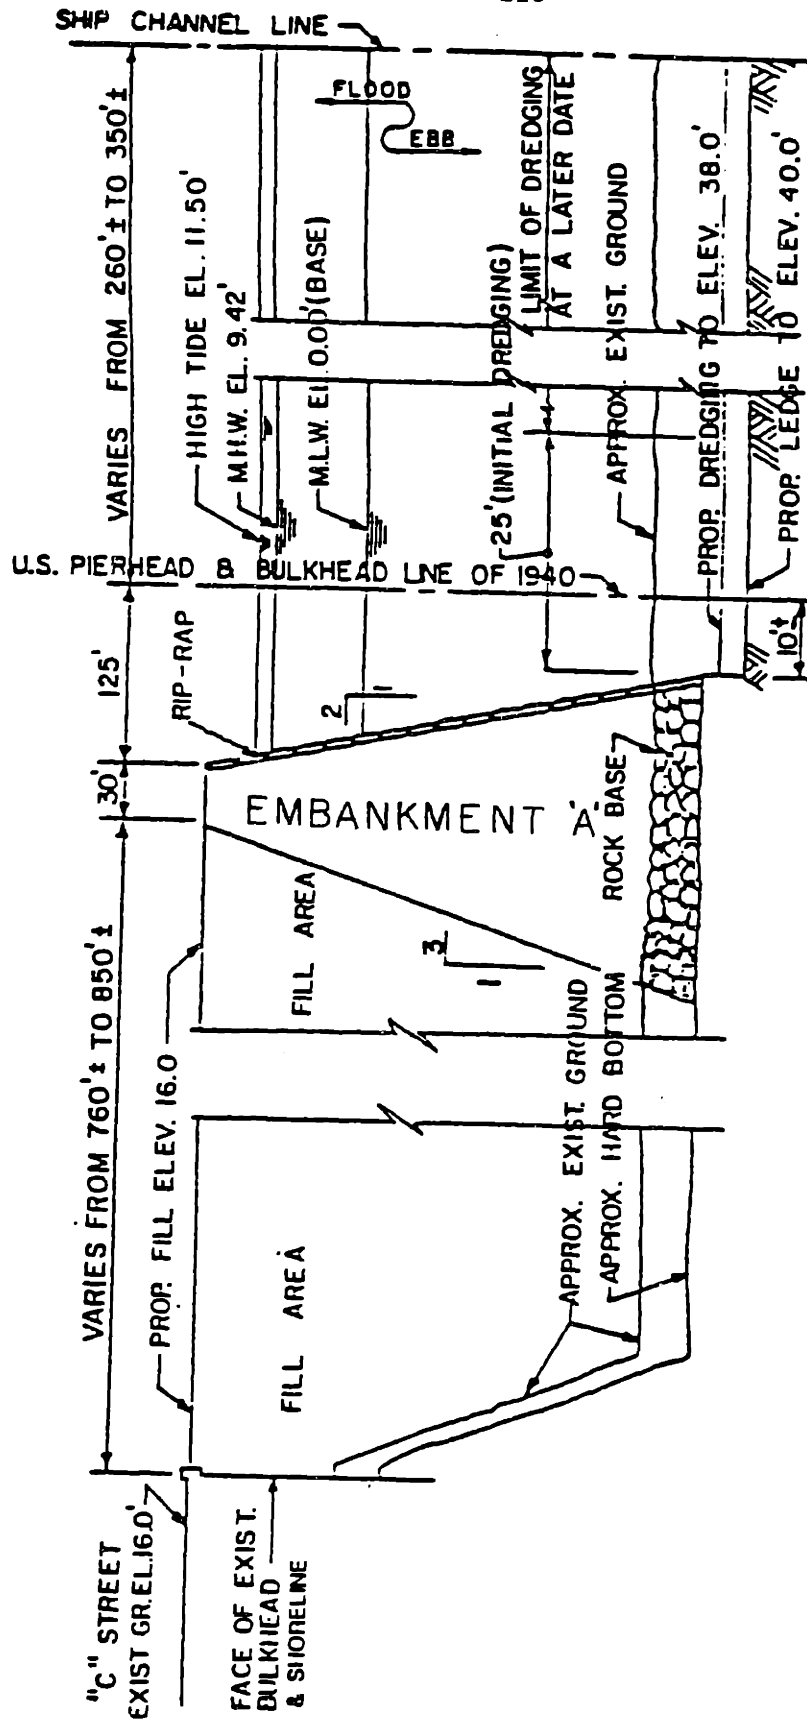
Typical Cross-section of Embankment 'A' (Cortell, Jason M., 1980)
